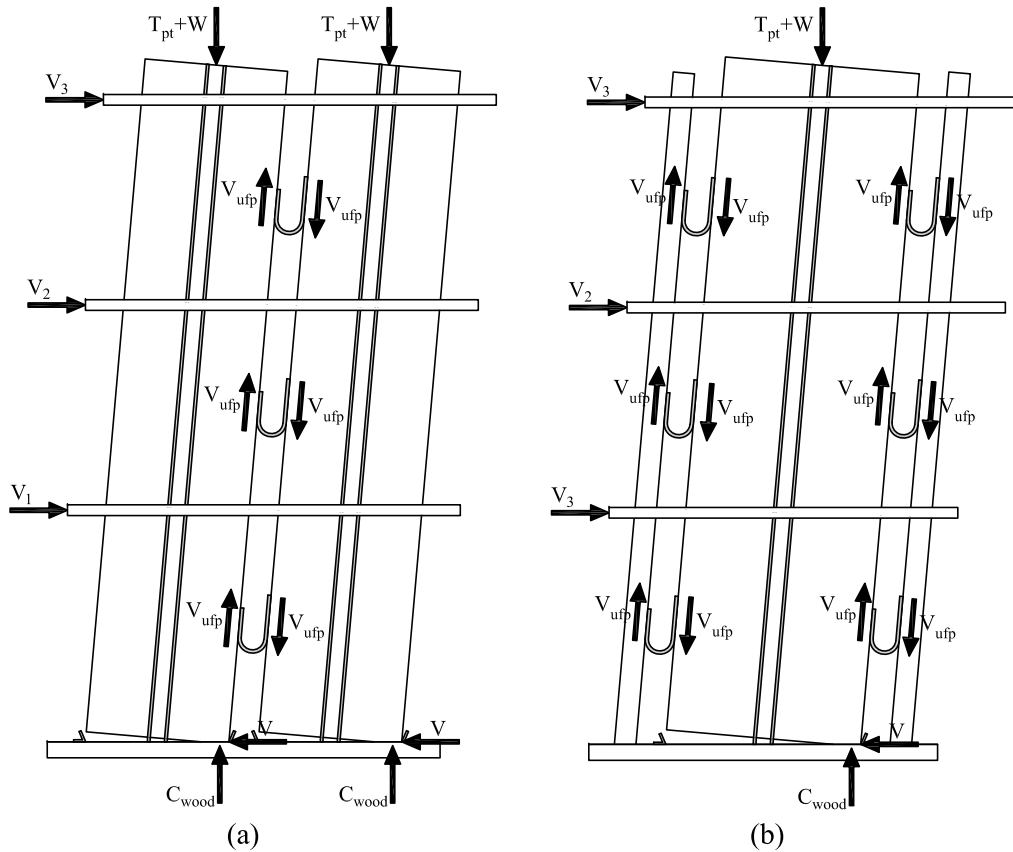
Rocking wall system behavior for (a) a paired post-tensioned rocking wall system and (b) a rocking wall with boundary columns
